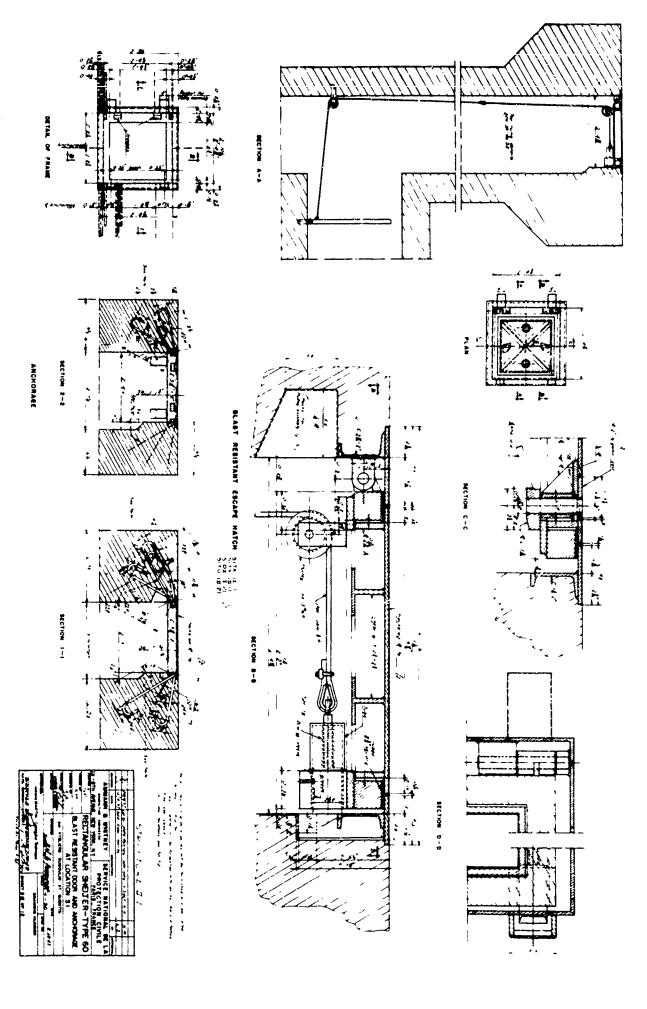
Rectangular shelter, type 60, blast-resistant door and anchorage at location S1.
